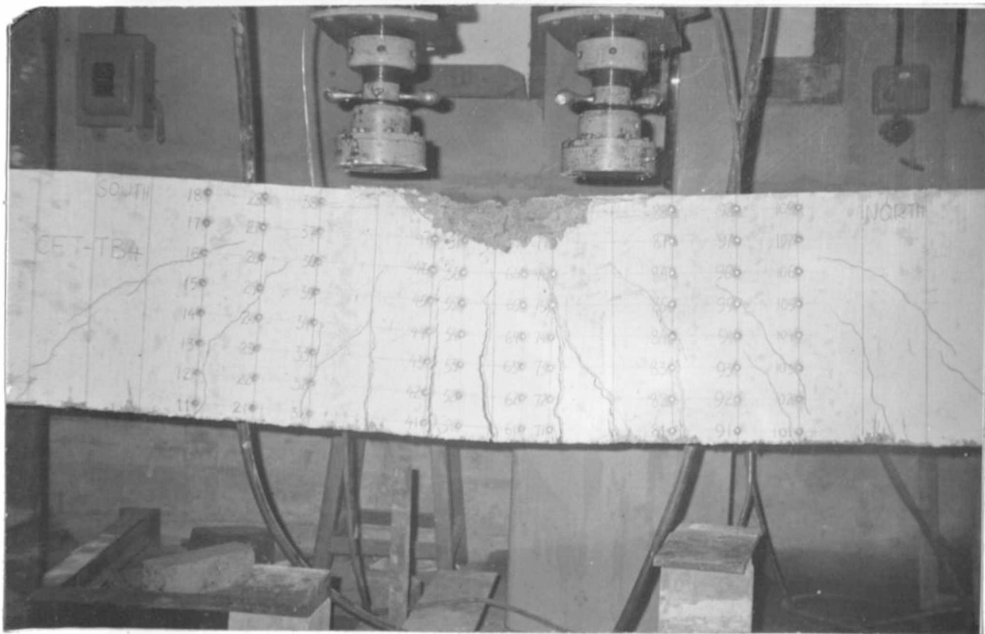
Beam CFT-TB4 at Failure (Sequence of Beam CFT-TB4 was typical of Beam CFT-TB2, CFT-TB3, CFT-TB7 and CFT-TB8)
